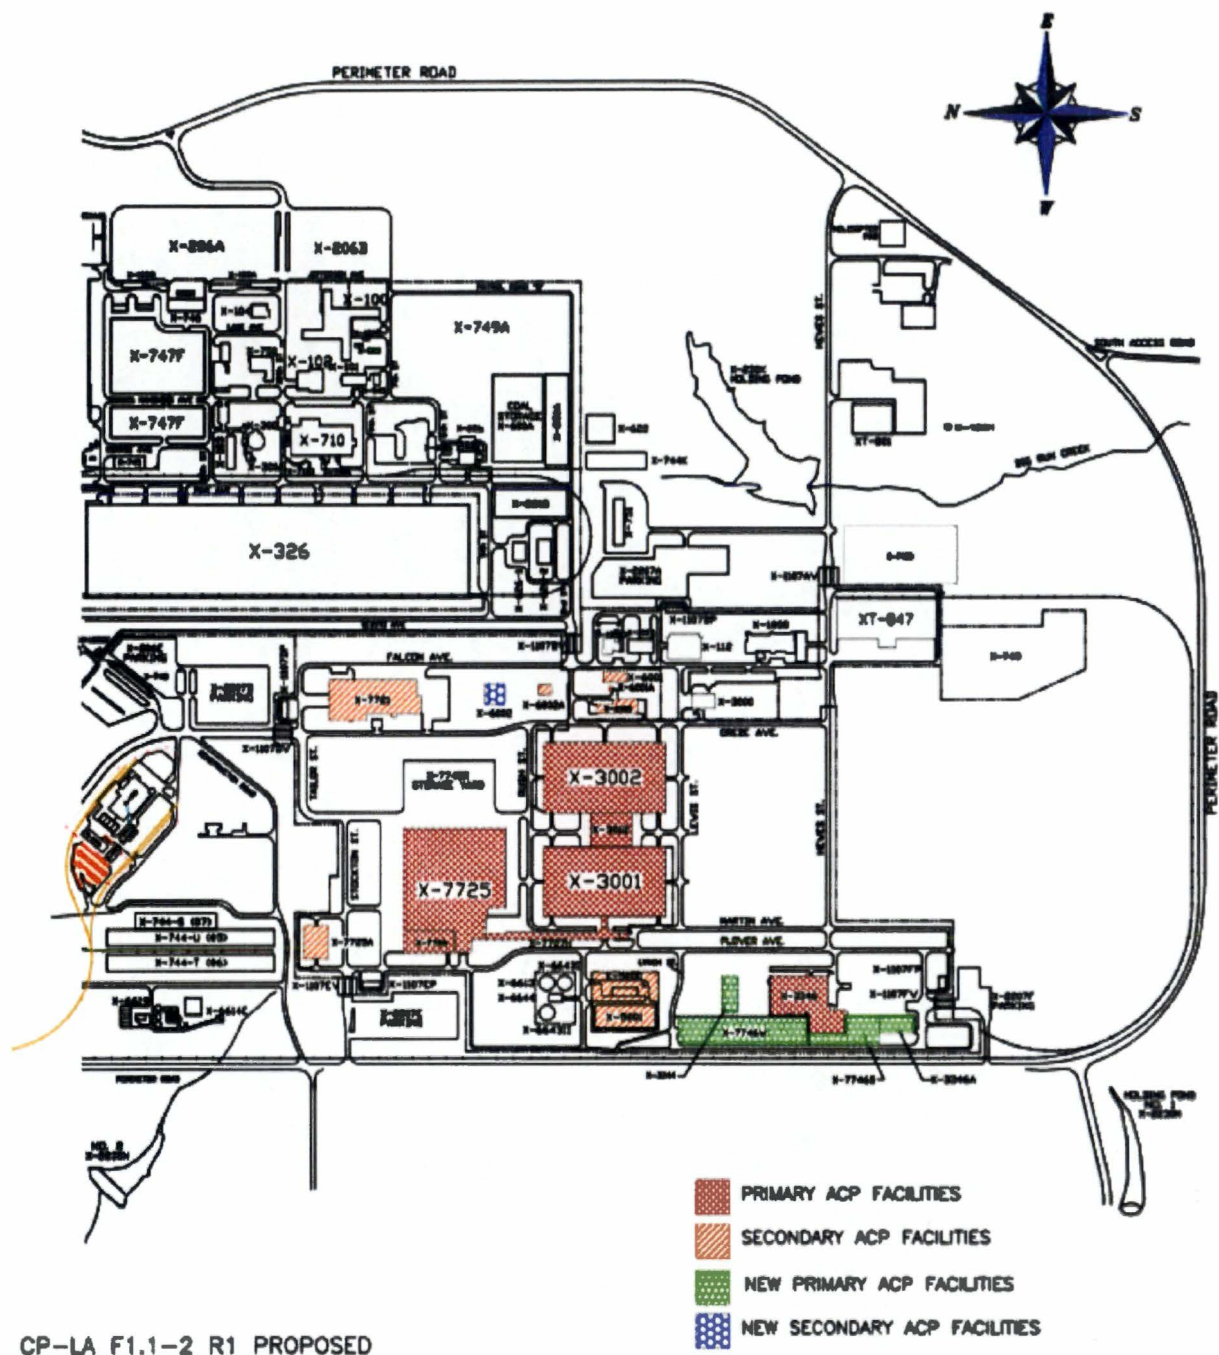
Primary/Secondary American Centrifuge Plant Facilities
